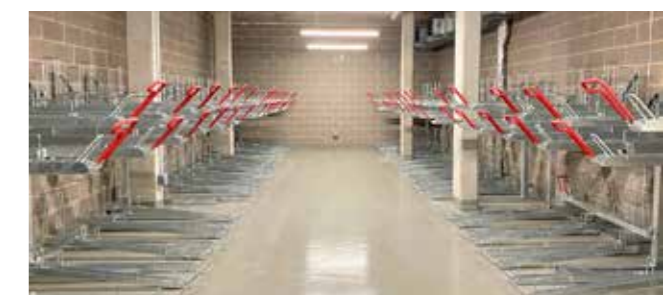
Secure cycle parking should be provided within apartment buildings.
